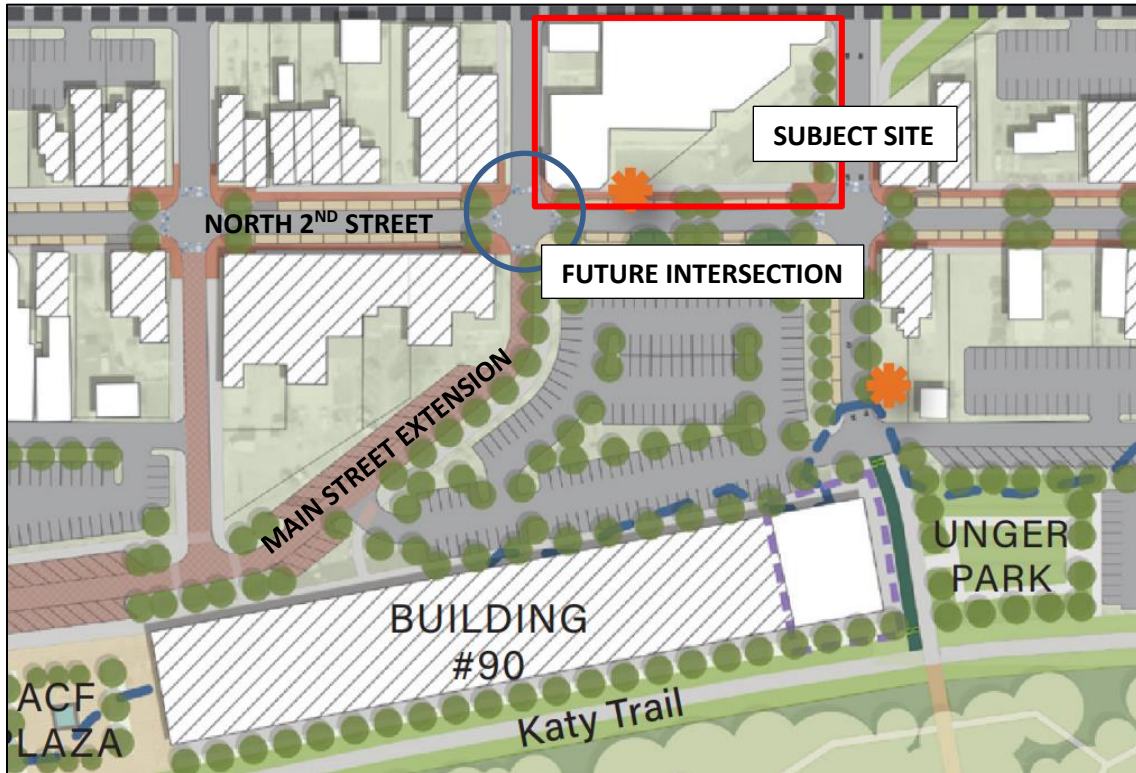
Proposed Main Street Extension intersection with North 2<sup>nd</sup> Street adjacent to site.
